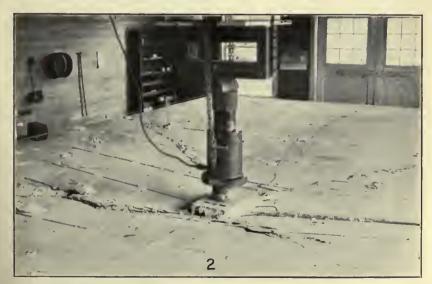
Load-measuring apparatus and hydraulic jack for testing reinforced-concrete slabs.
